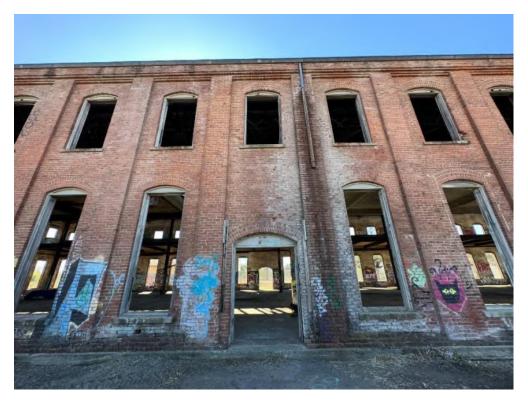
Doorway on Central Bay of Side Elevations, facing Southwest
